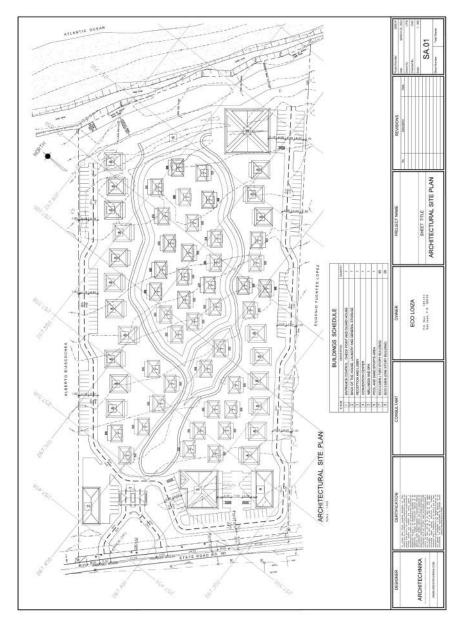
Proposed Development Partial Site Plan (Source: Vaciatalega Village SE.).
